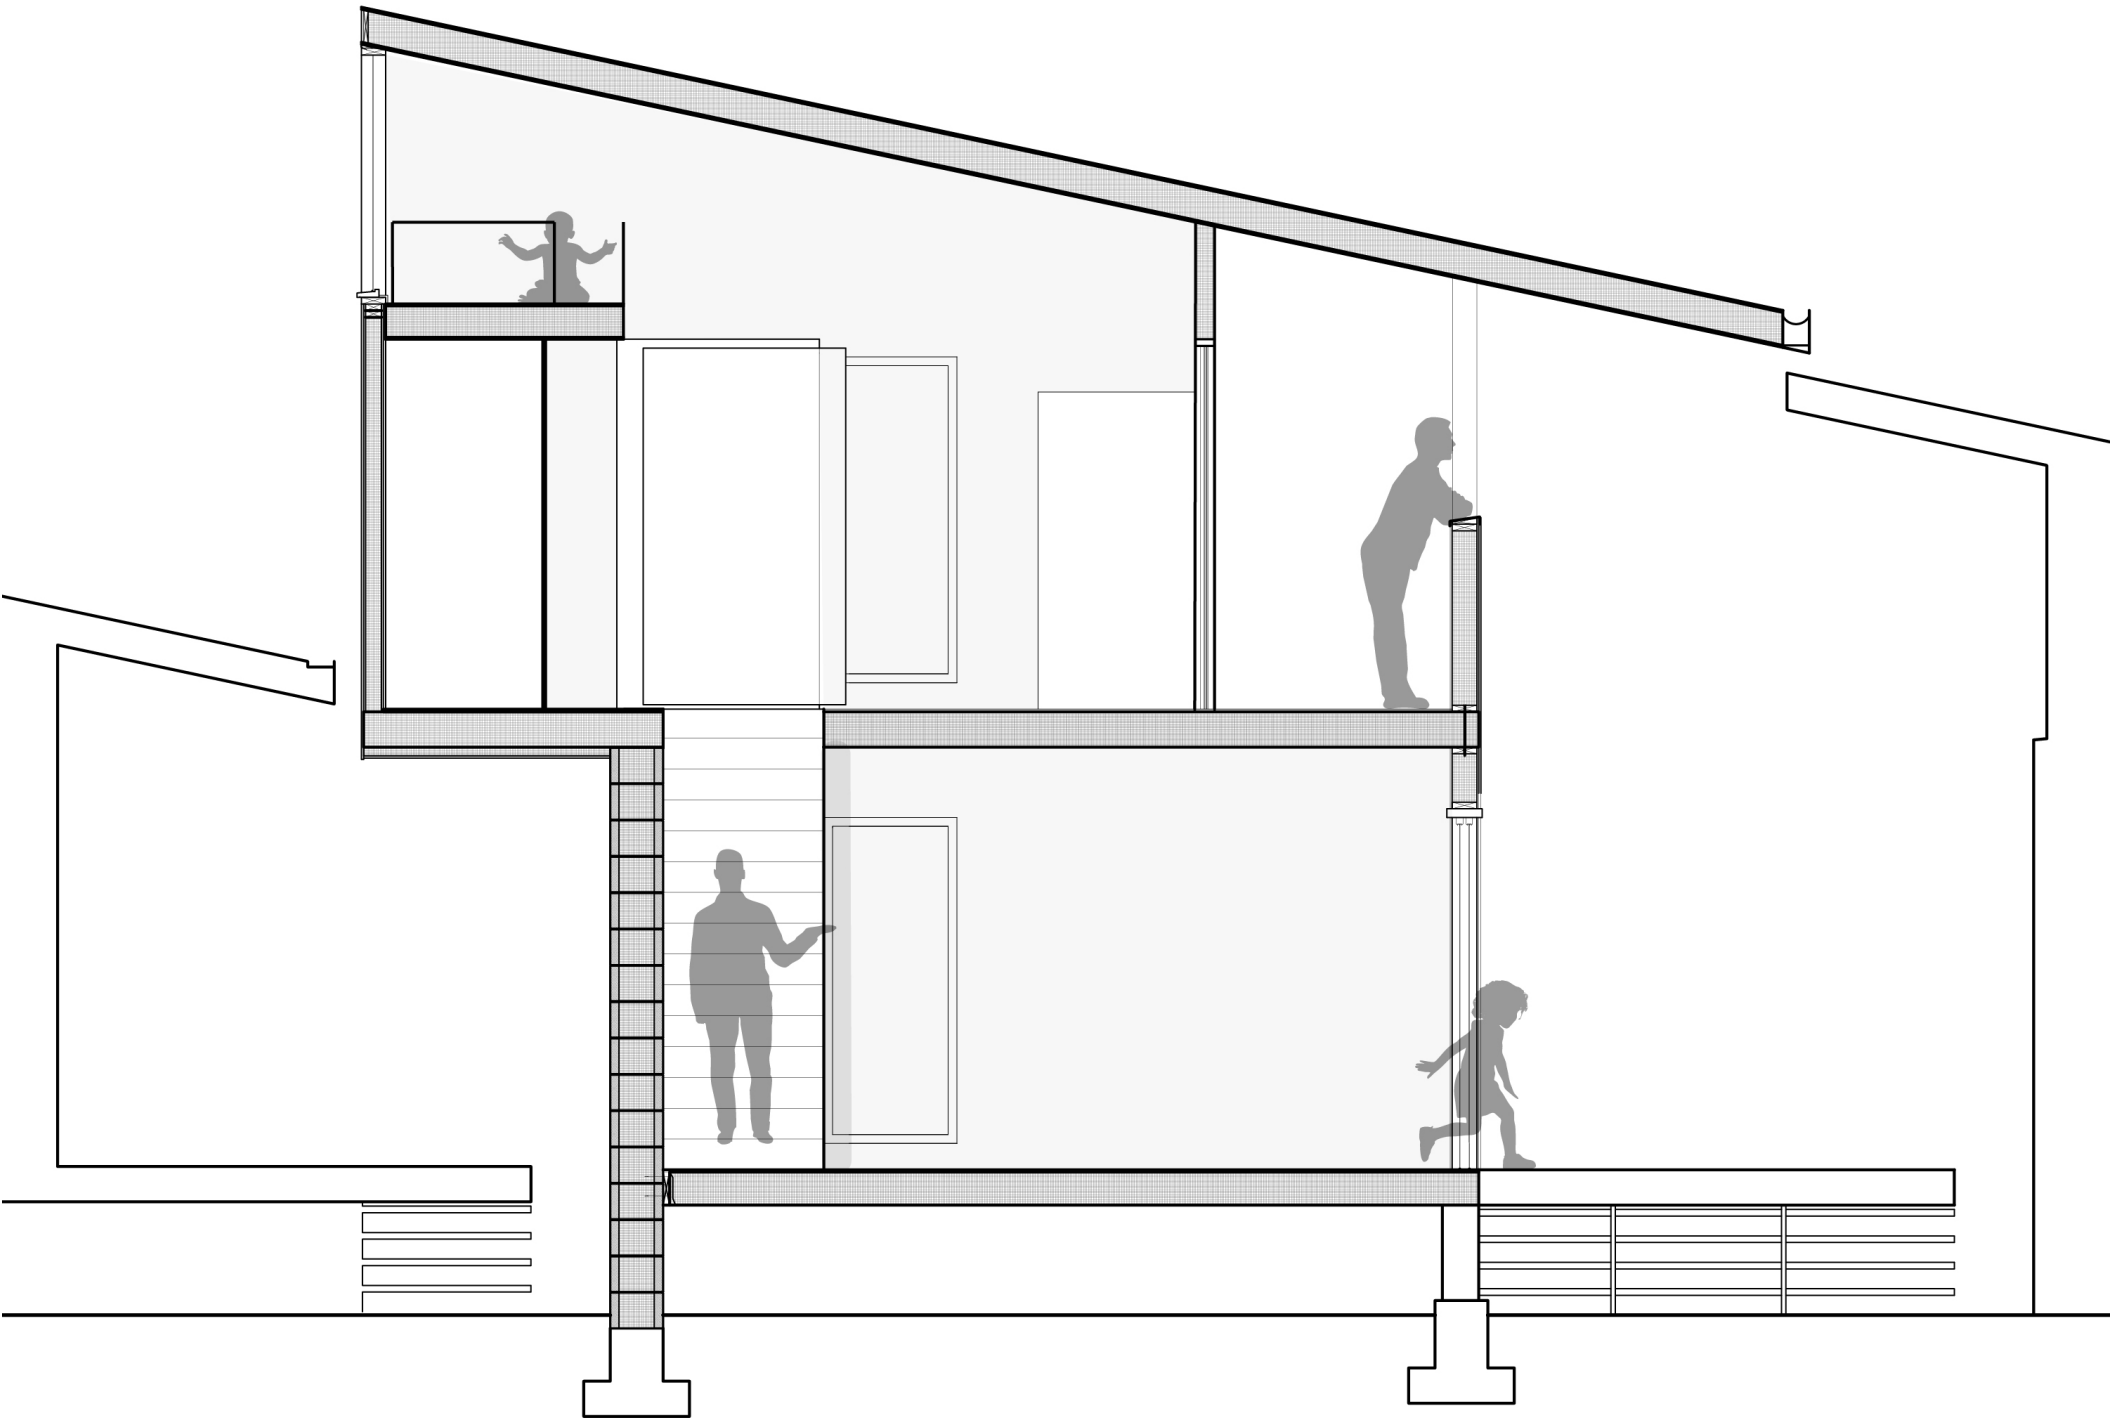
SECTION SHOWING EXPRESSED CMU WALL, AND BLEND OF SPACE FROM INTERIOR TO EXTERIOR
